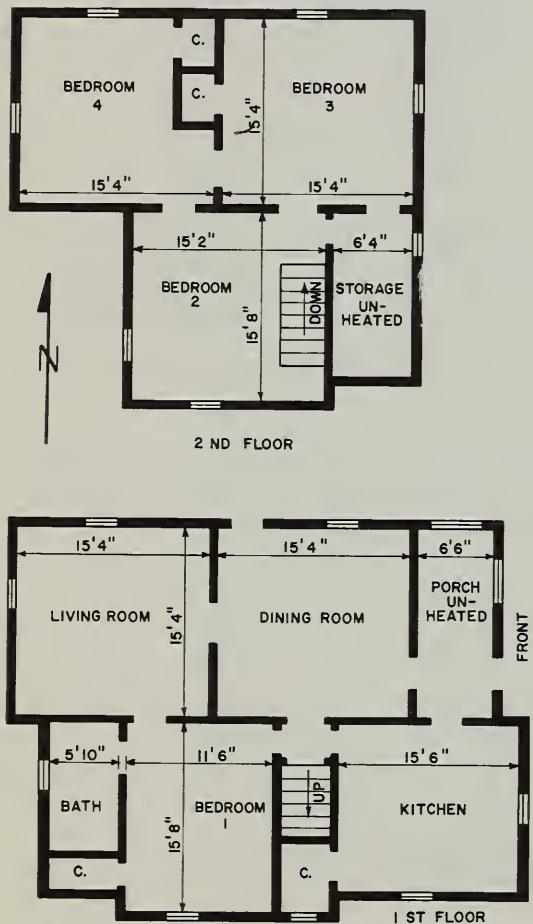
Floor plan of house H, a 2-story frame structure with a crawl space, 46 years old.
